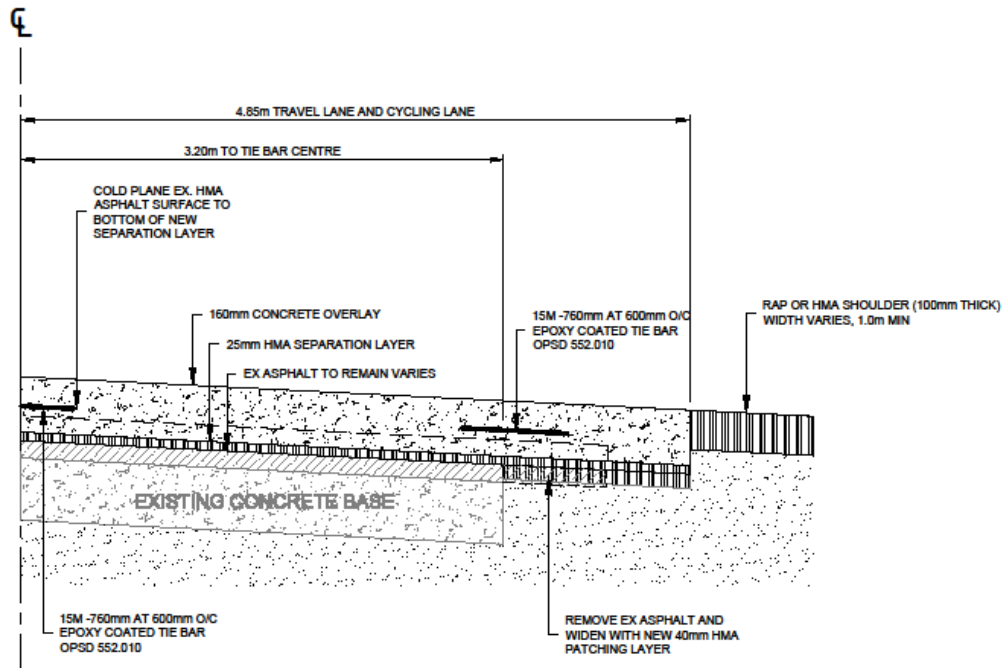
Unbonded Concrete Overlay Detail (Region Design Drawings 2014).
